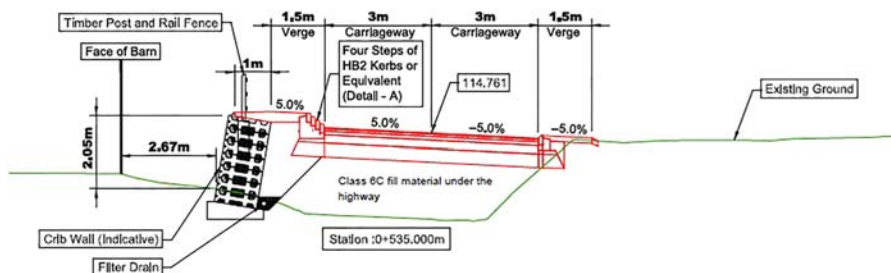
Section showing location of crib wall and Class 6C highway embankment fill material. Source(s): Authors' own work
